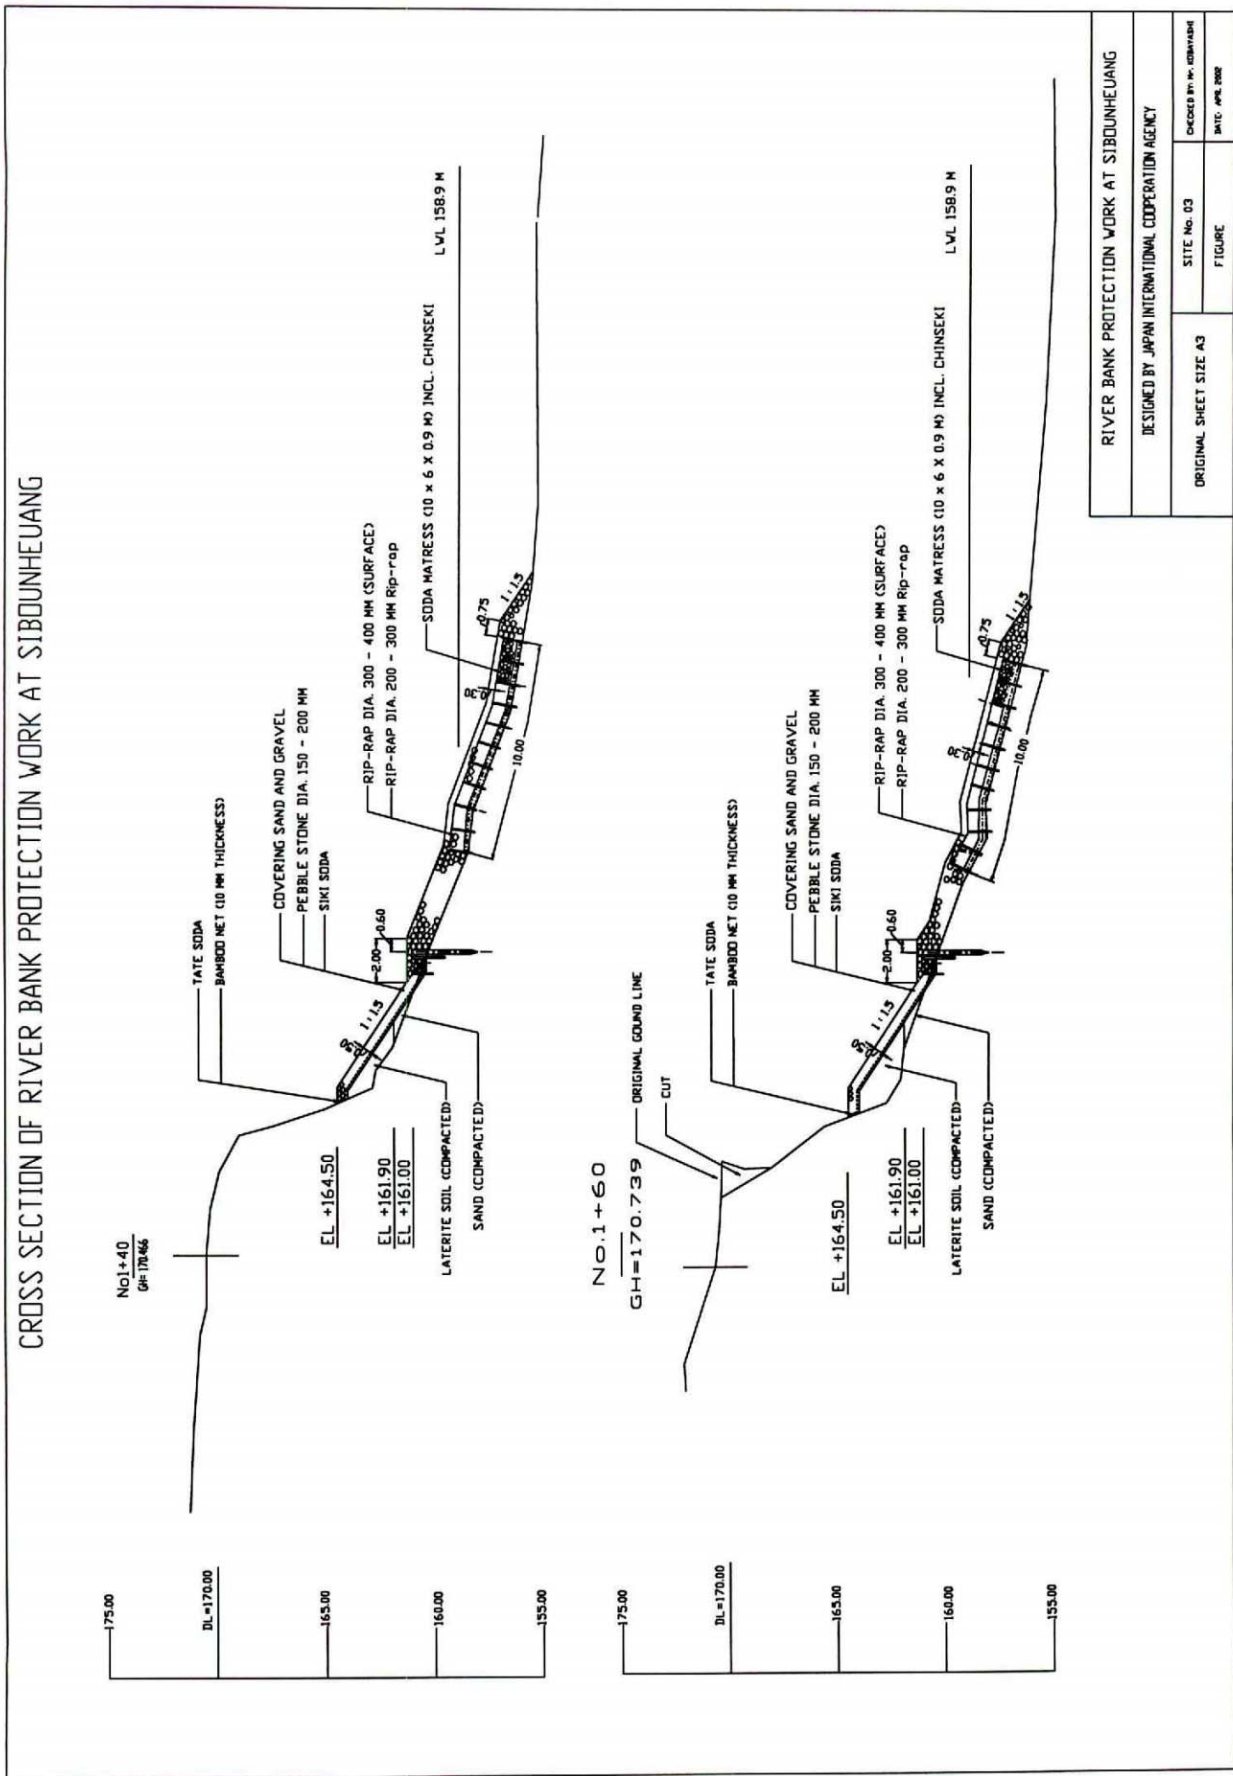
(3/5) Cross Section of River Bank Protection Work at Sibounheuang Site
